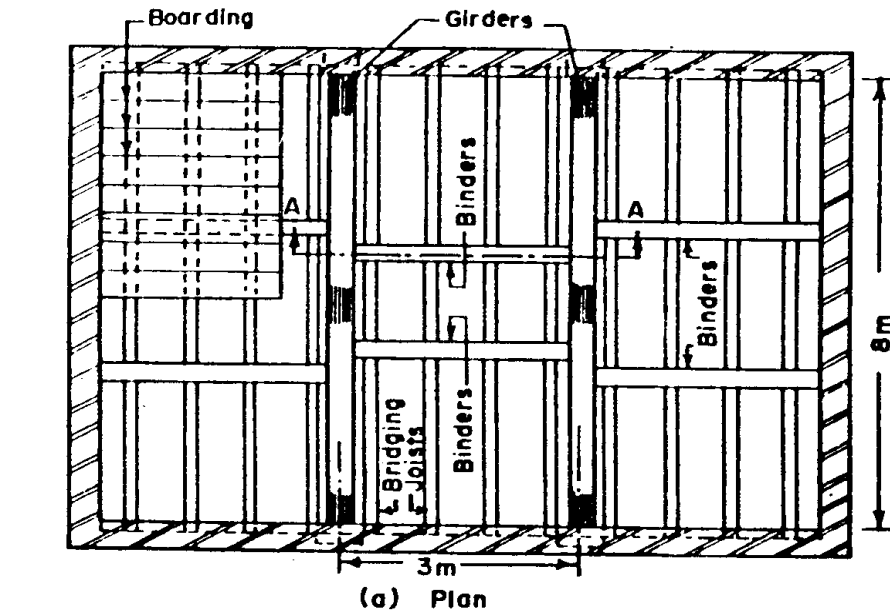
FIG FRAMED OR TRIPLE JOISTS TIMBER FLOORING
